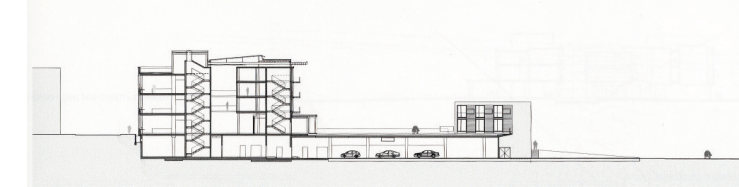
Cross section with guest house (Research and Technology Buildings, 2005)
